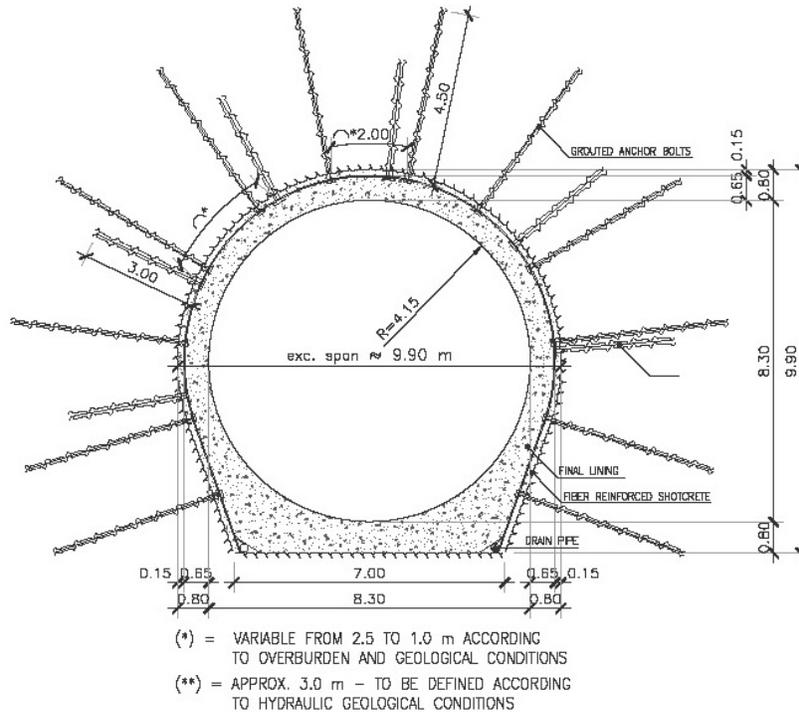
Sunkoshi Headrace Tunnel Typical Cross Section (Horseshoe Shape)
